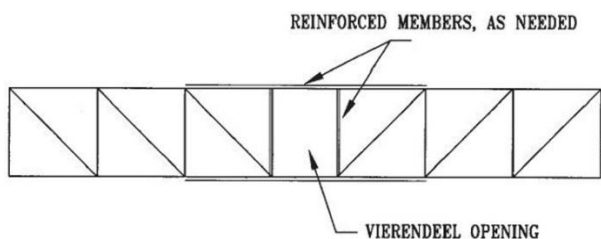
AISC guide No. 14 proposed plan for reinforcing special segment
